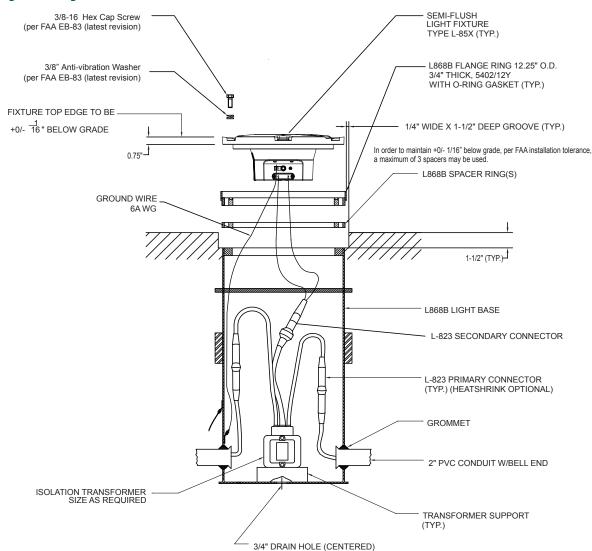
Diagram of the Fixture Installed in a 1-Piece Base Can
